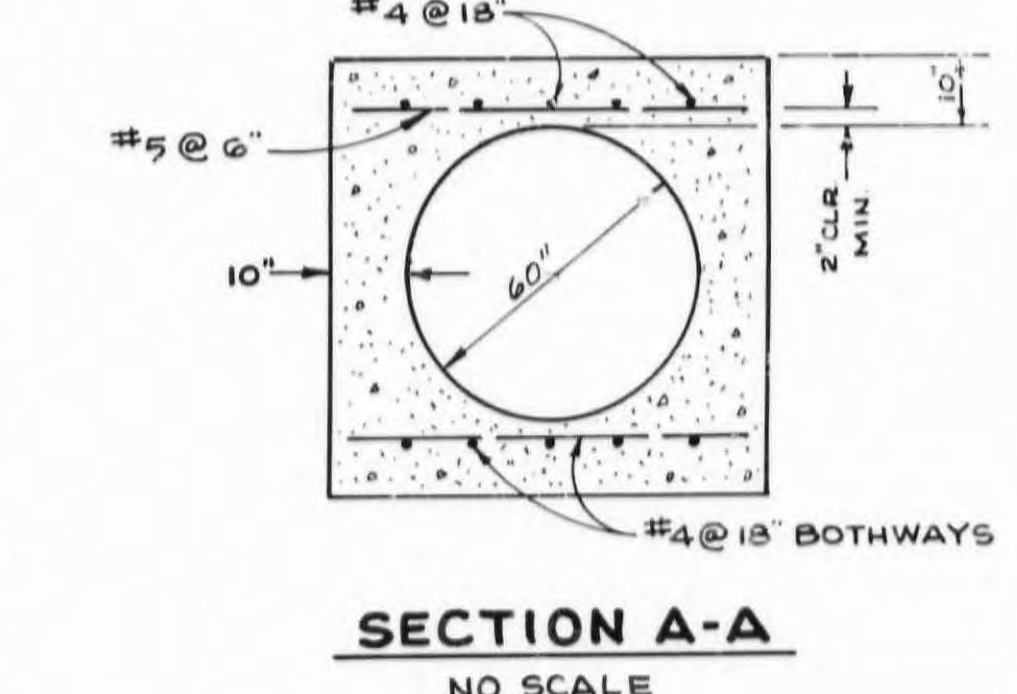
DETAIL OF TOP OF JUNC. STRUCT. TYPE 'C'
